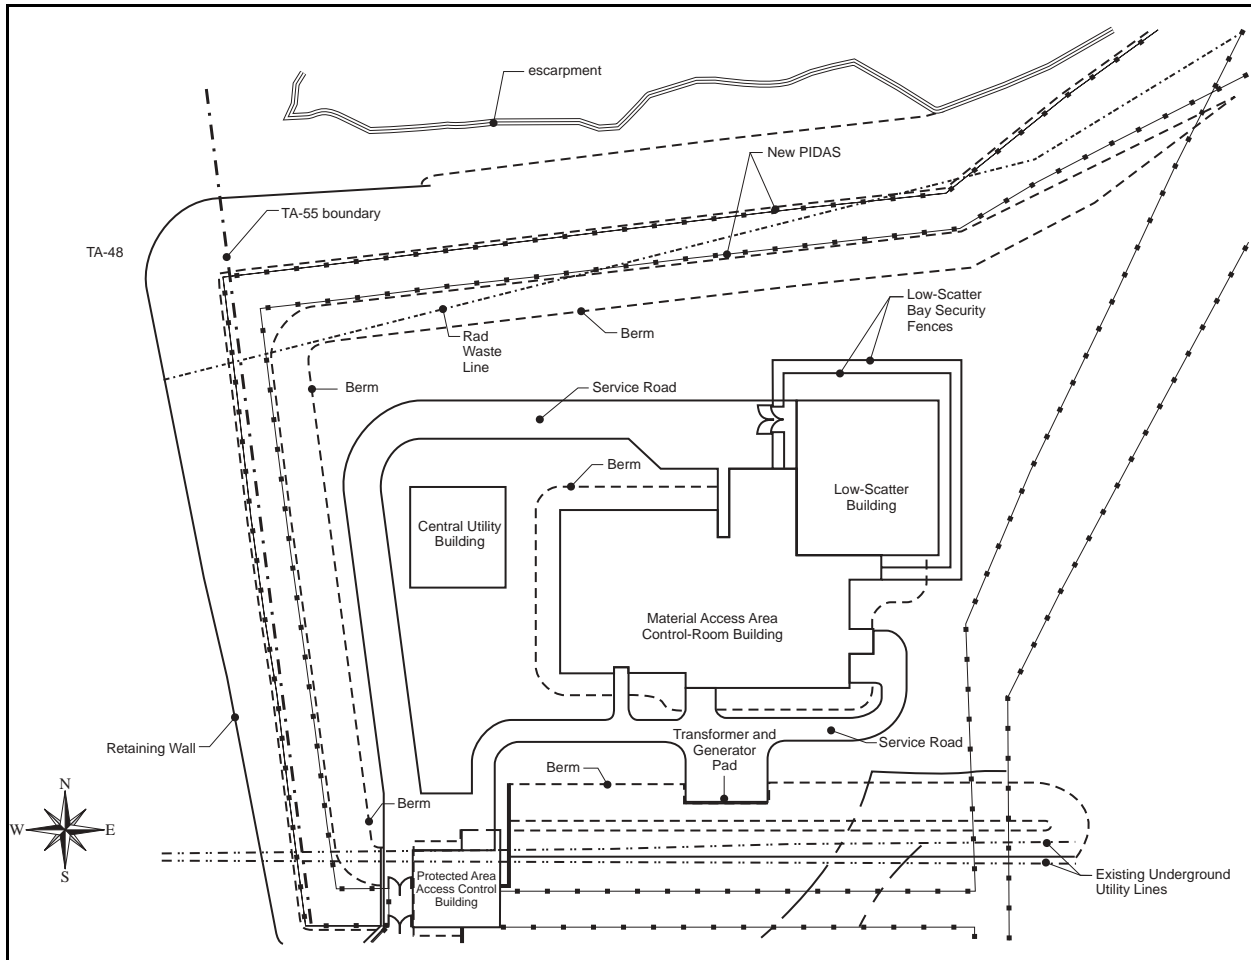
Site Plan for Proposed LANL Facility (LANL New Facility Alternative)
